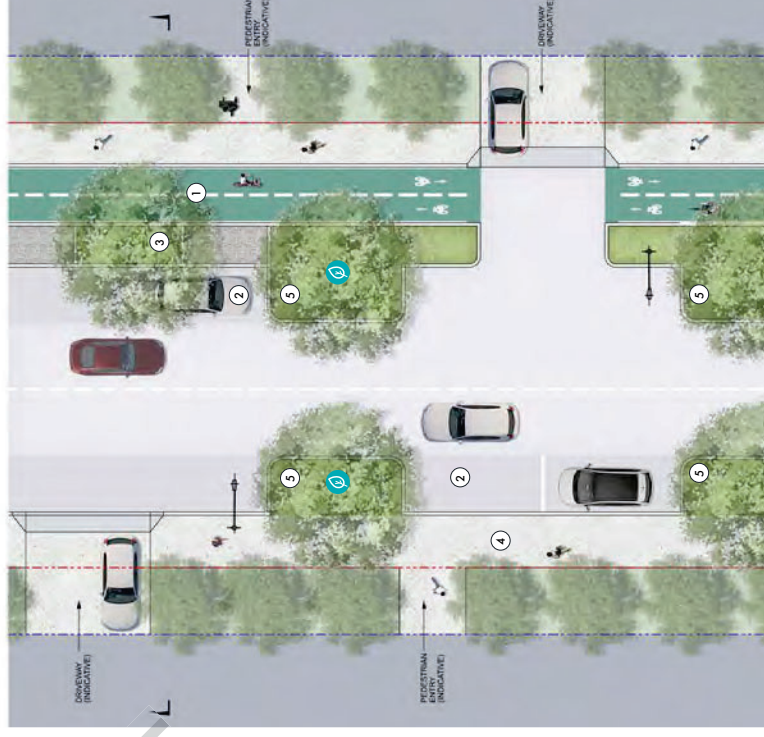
Denham Street, Denham Street Extension (New Street) and Llewellyn Street - Typical Plan
